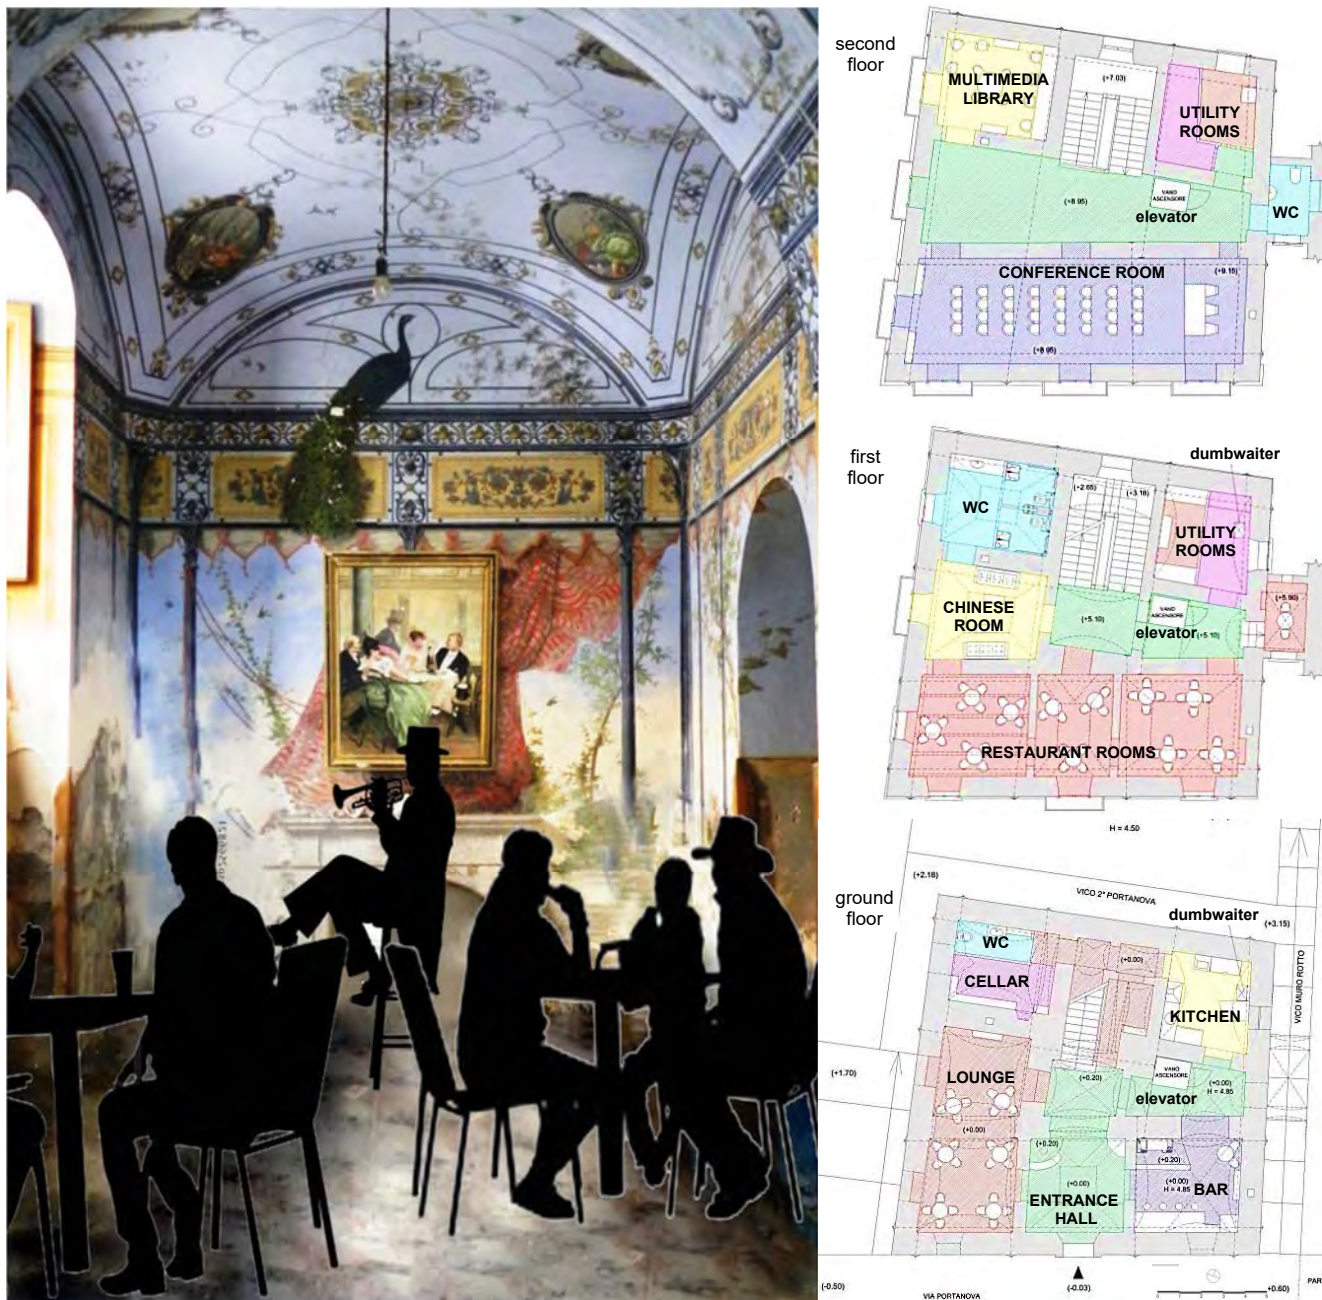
On the left: rendering draft of the reconverted lounge room. On the right: design layout plans
